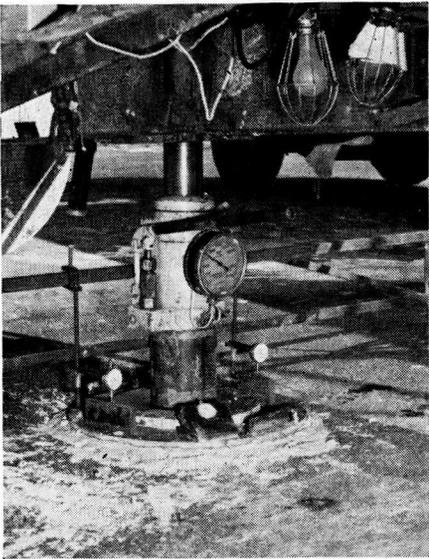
Loading Test on the Pavement with the 24-in. Plate
